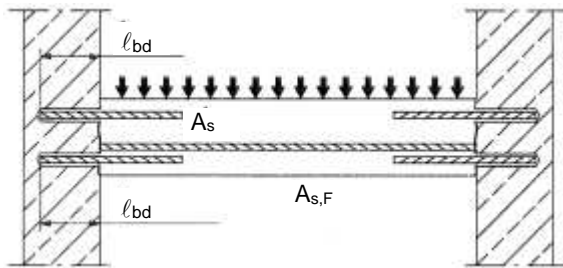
Anchoring of reinforcement to cover the line of acting tensile force
